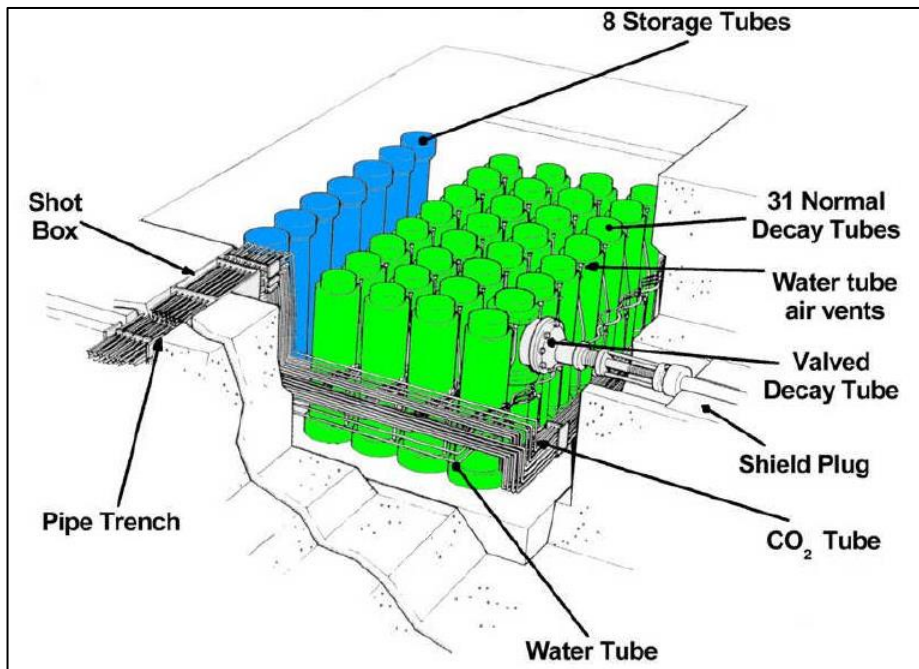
Typical AGR Irradiated Fuel Buffer Store [Ref.18]
